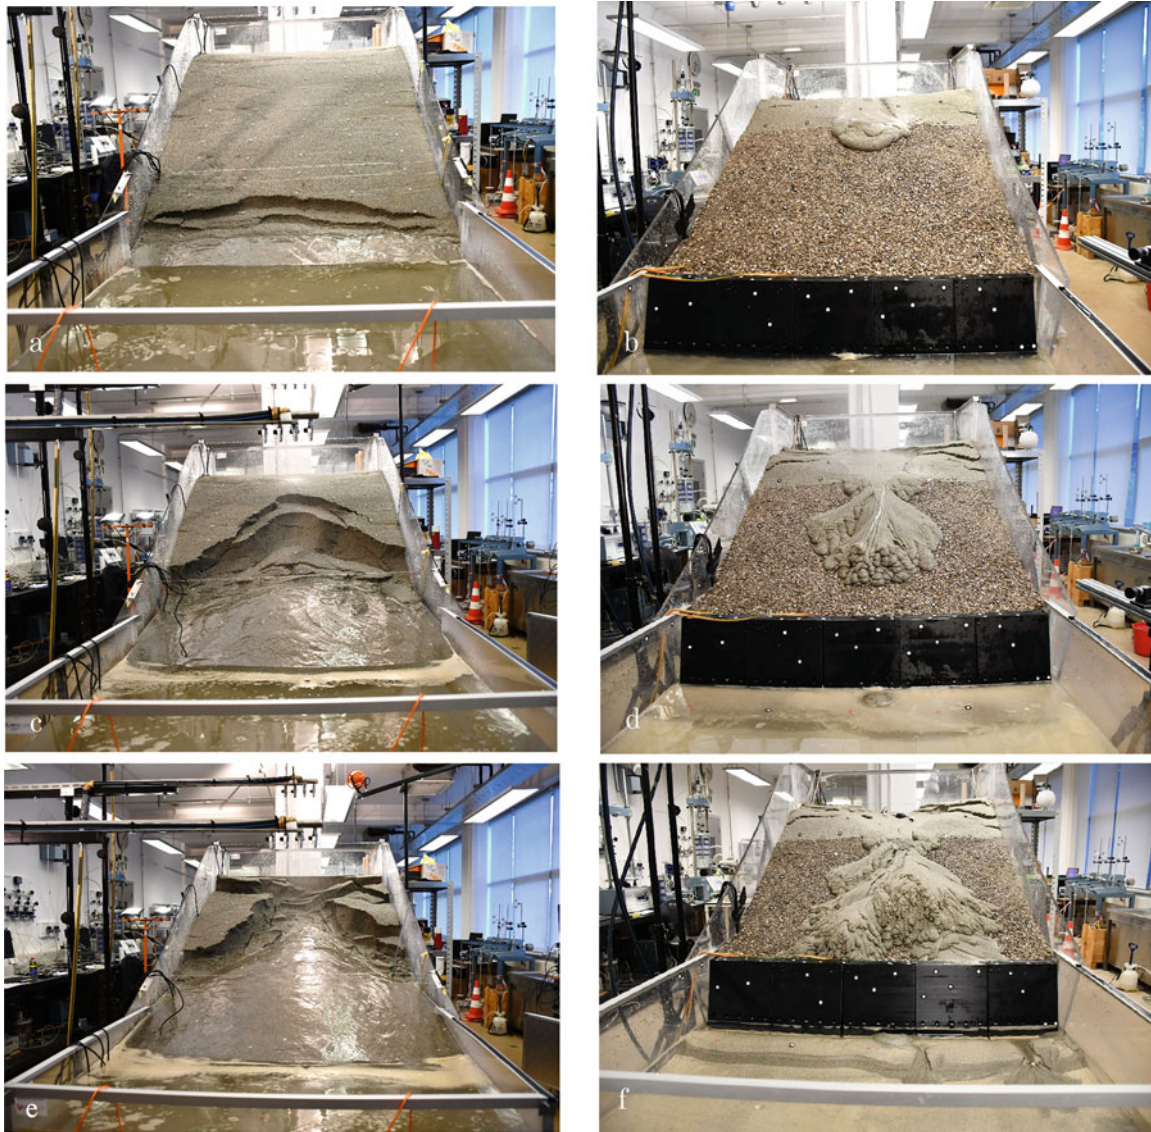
Development of landslides in small-scale sandy slope without and with installed gravity retaining wall: (a) initial instability in the foot of the unsupported slope (62 min), (b) slope after the first cracks in the slope with retaining wall (129 min), (c) development of the landslide to the top of the unsupported slope (90 min), (d) development of the
